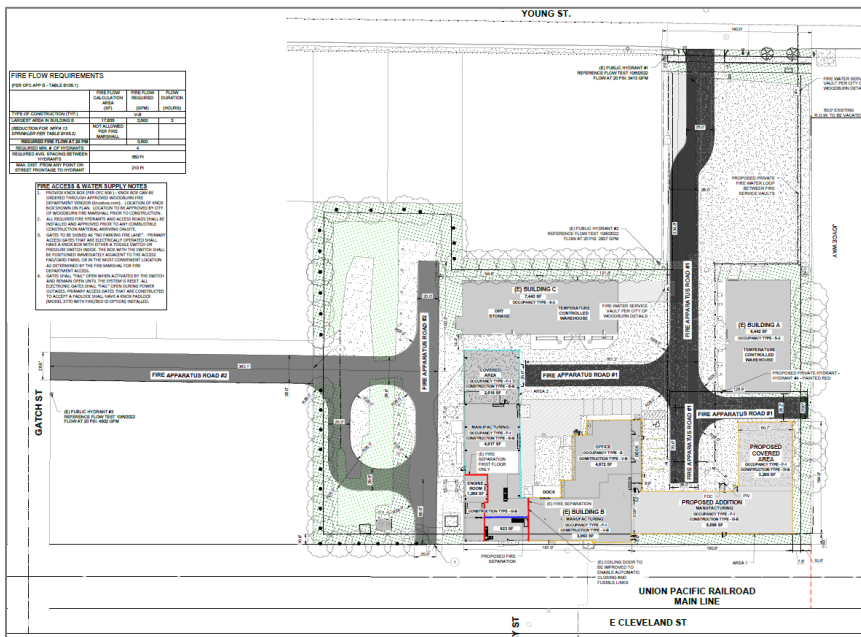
1 Sheet C004 Fire apparatus roads
